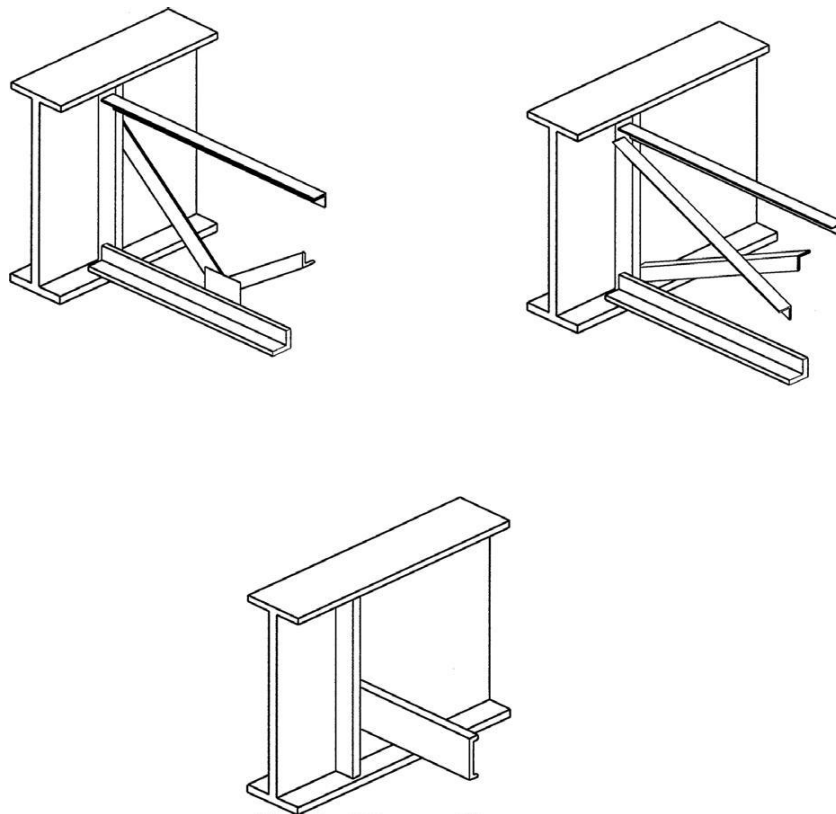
Schematic overview of cross bracing for girder bridges [6]. Top left: K-frame, top right: X-frame, bottom: girder
